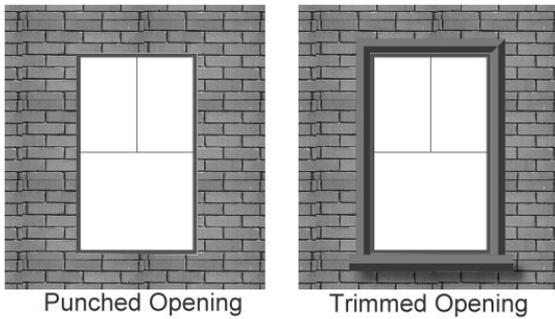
2/1 window shown in a punched (left) and trimmed (right) opening in a masonry wall.
